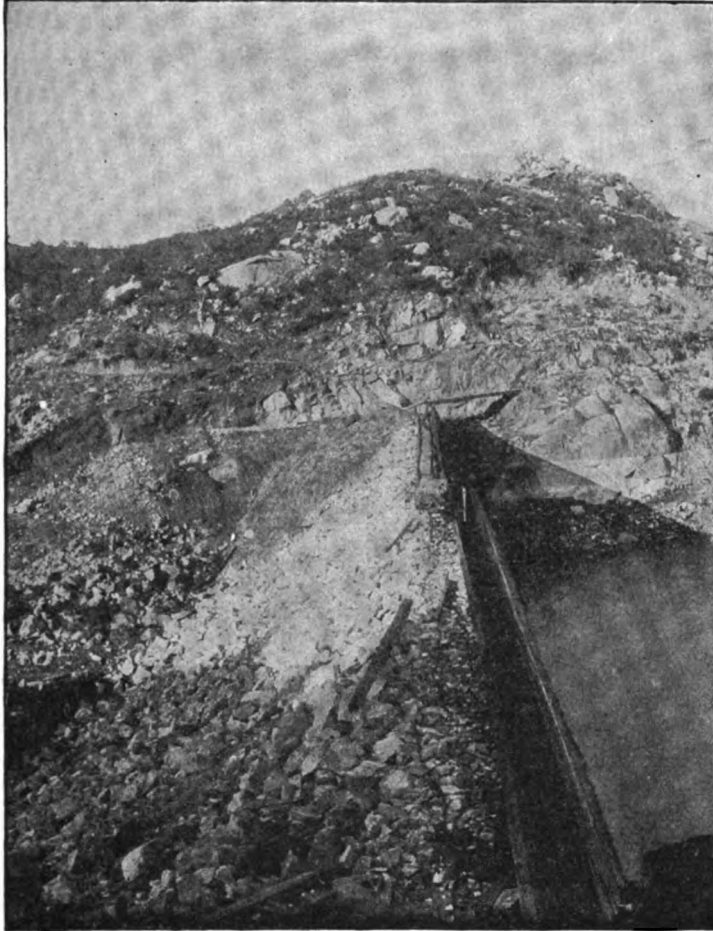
ESCONDIDO IRRIGATION DAM, LOOKING NORTH, SHOWING SPILLWAY.
